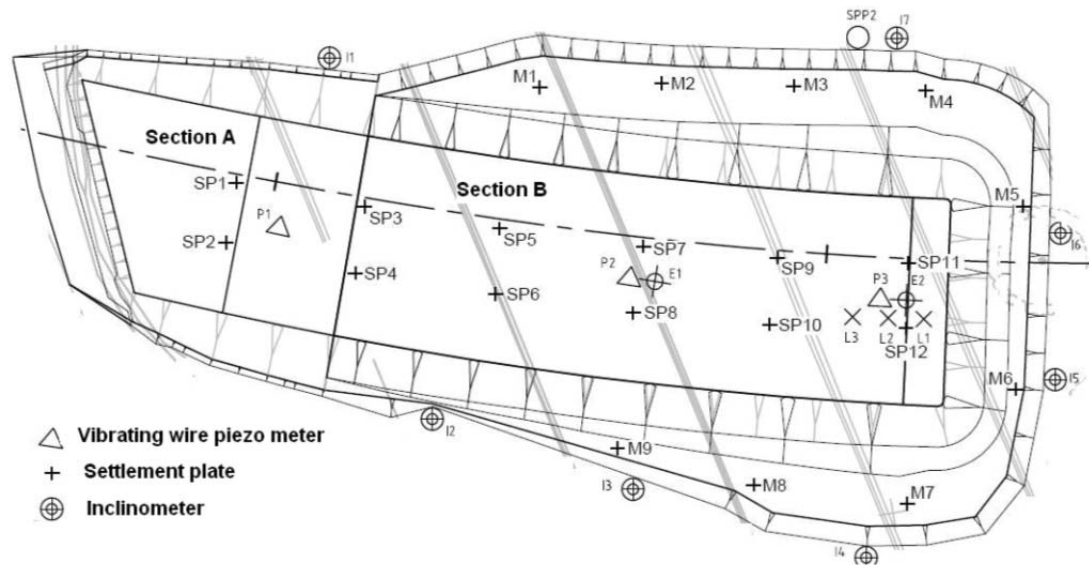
Instrumentation layout for the test embankments at Ballina Bypass (Indraratna et al. 2009).
